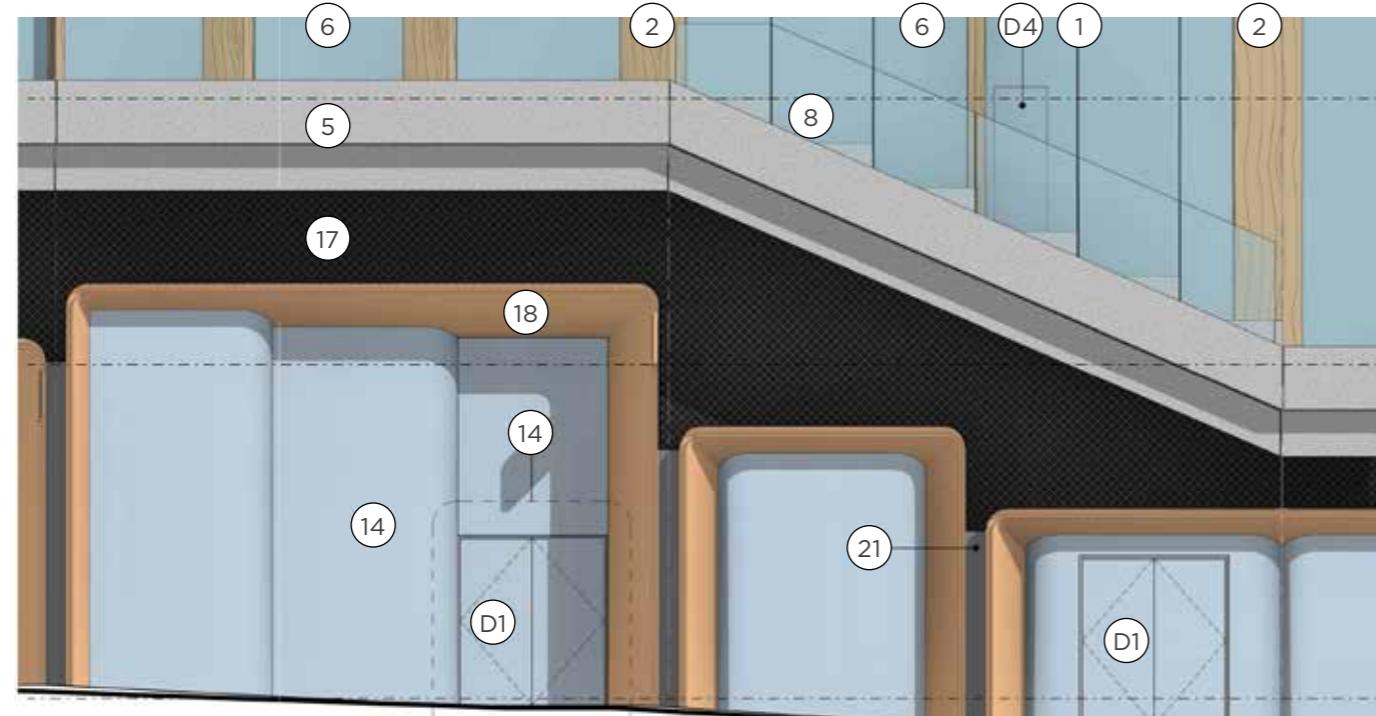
East and North elevations of the building indicating where the metal louvre screen, panel cladding and access ramp entrance are located
